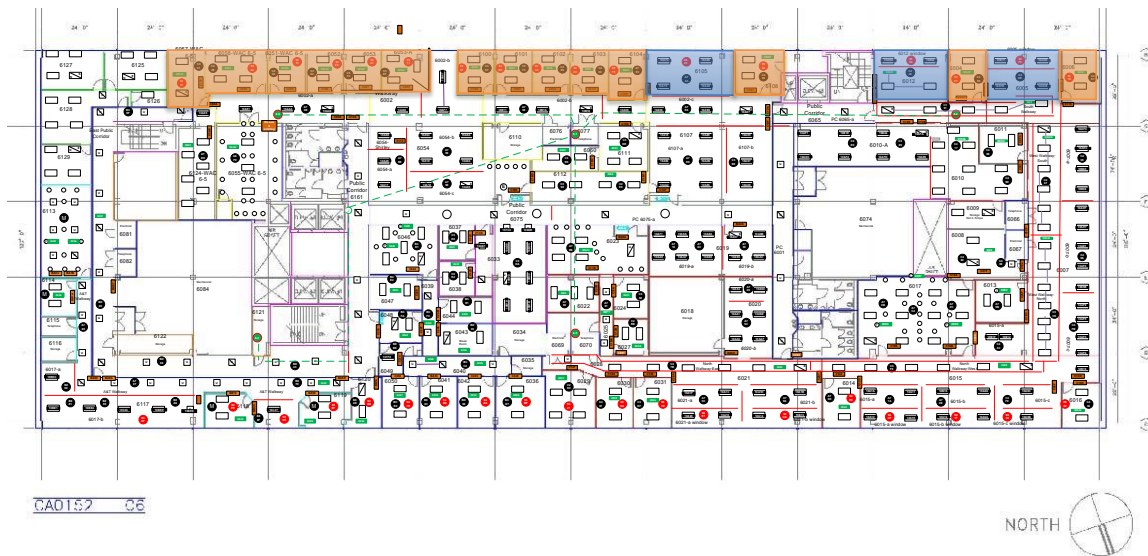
Floor plan (sixth floor). South façade runs along the top of the figure. Areas studied are shaded in orange (private offices) and blue (open plan offices).
